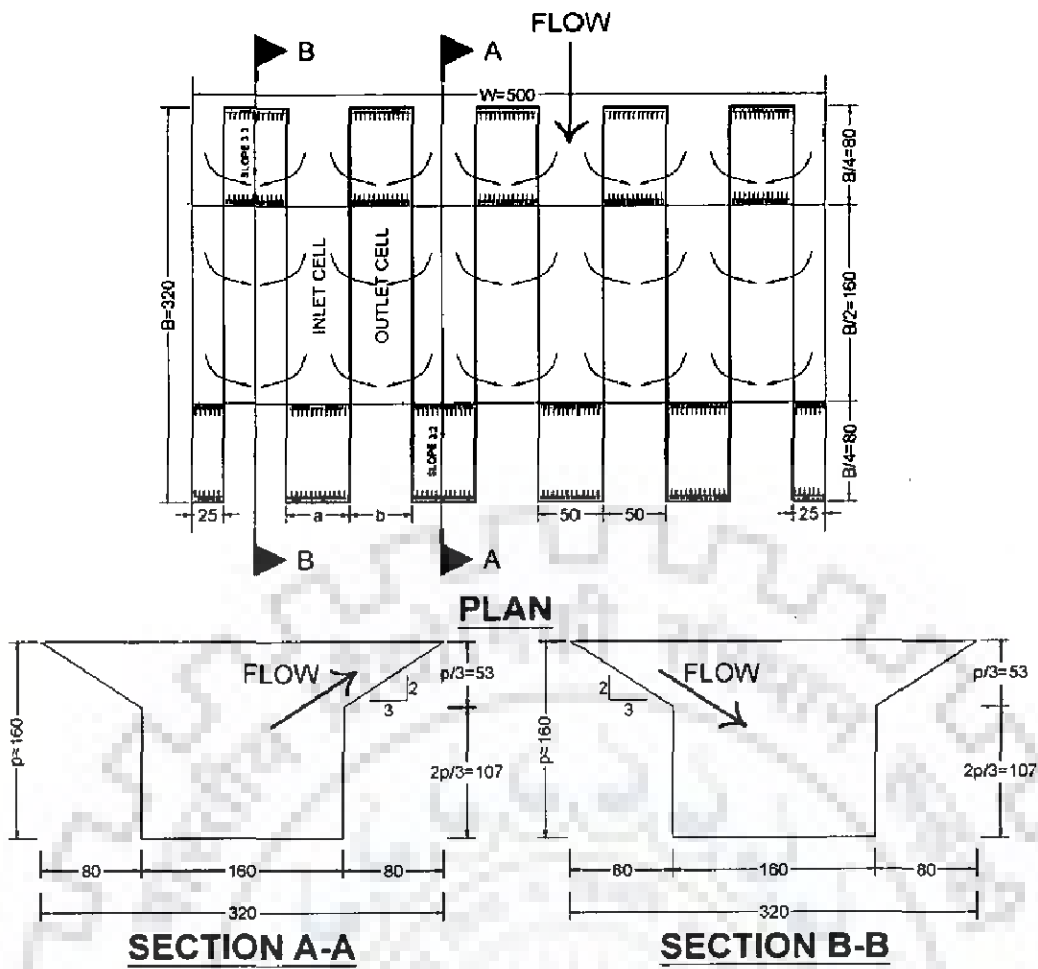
Plan and section of model  $P_1M_2$  (dimensions in mm)
